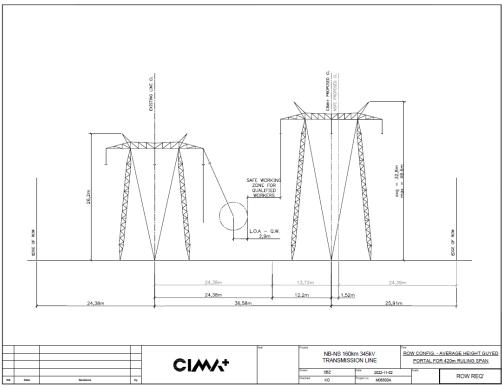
Example of a Guyed Portal Tangent Steel Lattice Tower Design
